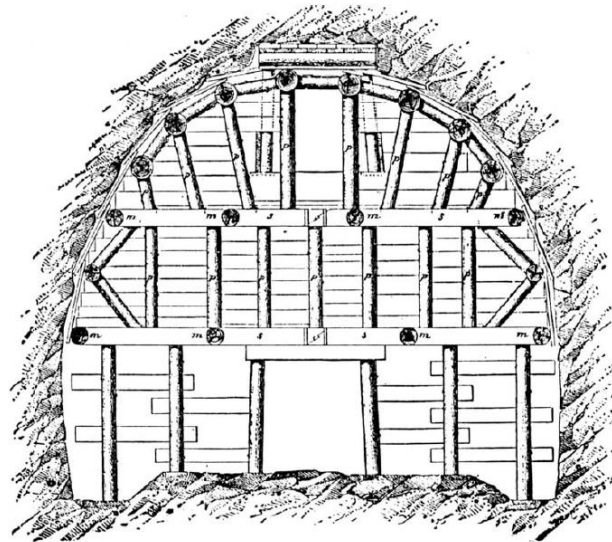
The first Swiss tunnel was the 8,198-ft.-long Hauenstein Tunnel on the central railway between Bâle and Olten. This 25.6×19.7 ft. tunnel was built 1853–8 by the famous British railway contractor Thomas Brassey.
